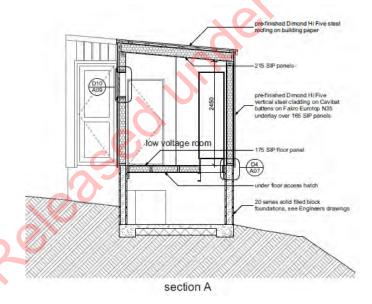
Plans of hut foundations for both operators' huts. Refer attachment "Excavation Plan - Tūroa Building Upgrades
